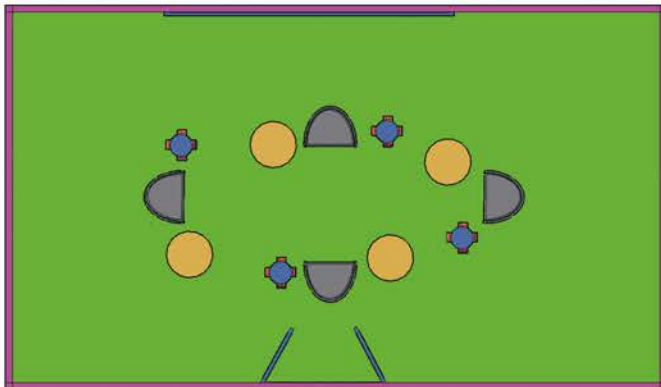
Top view of the furniture inserted, copies and places in position
